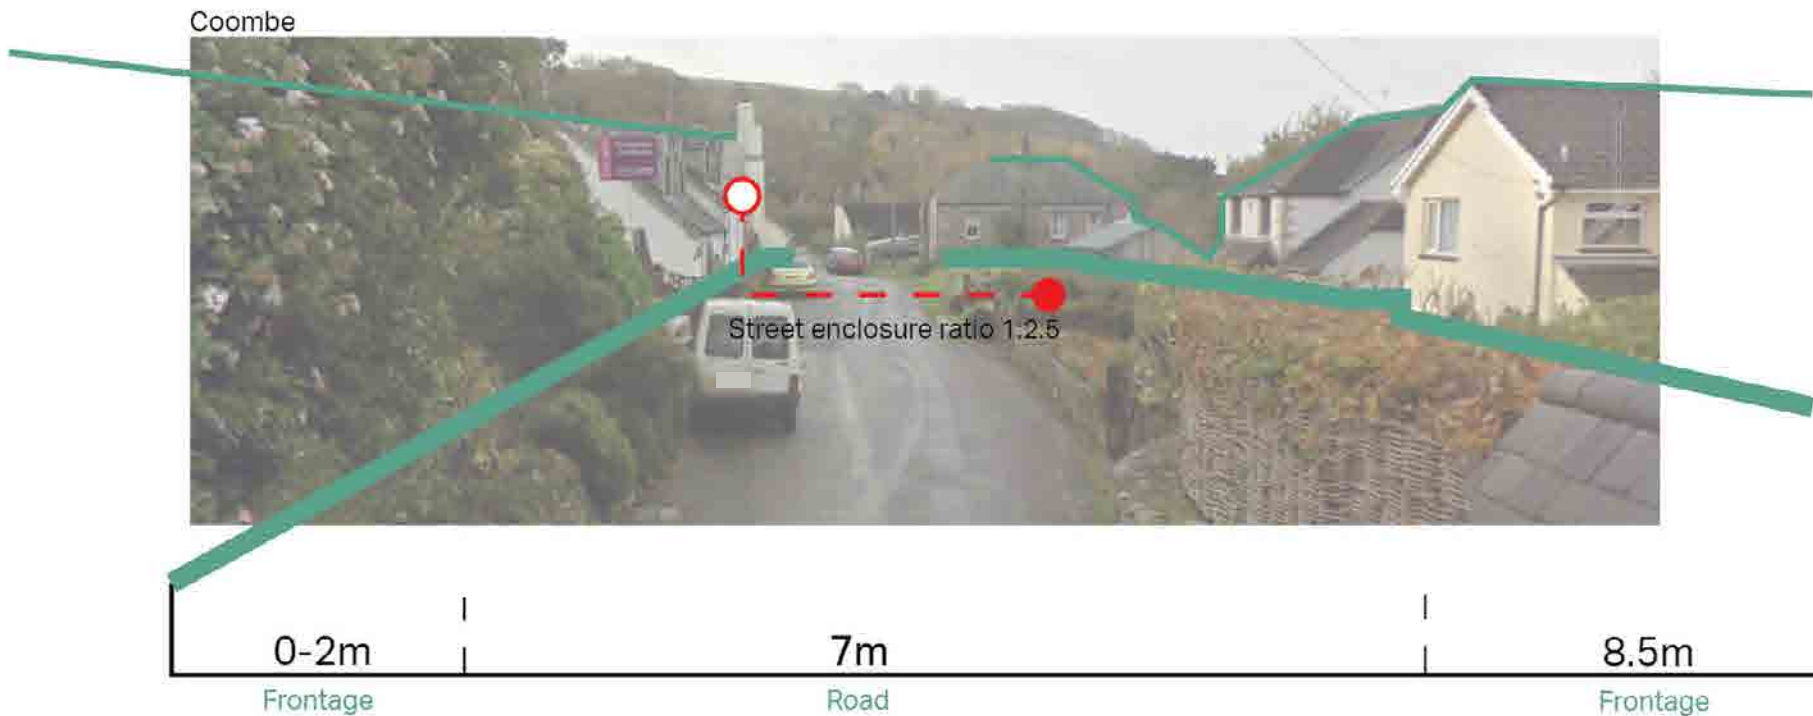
Diagram to demonstrate typical street dimensions and enclosure ratio.
